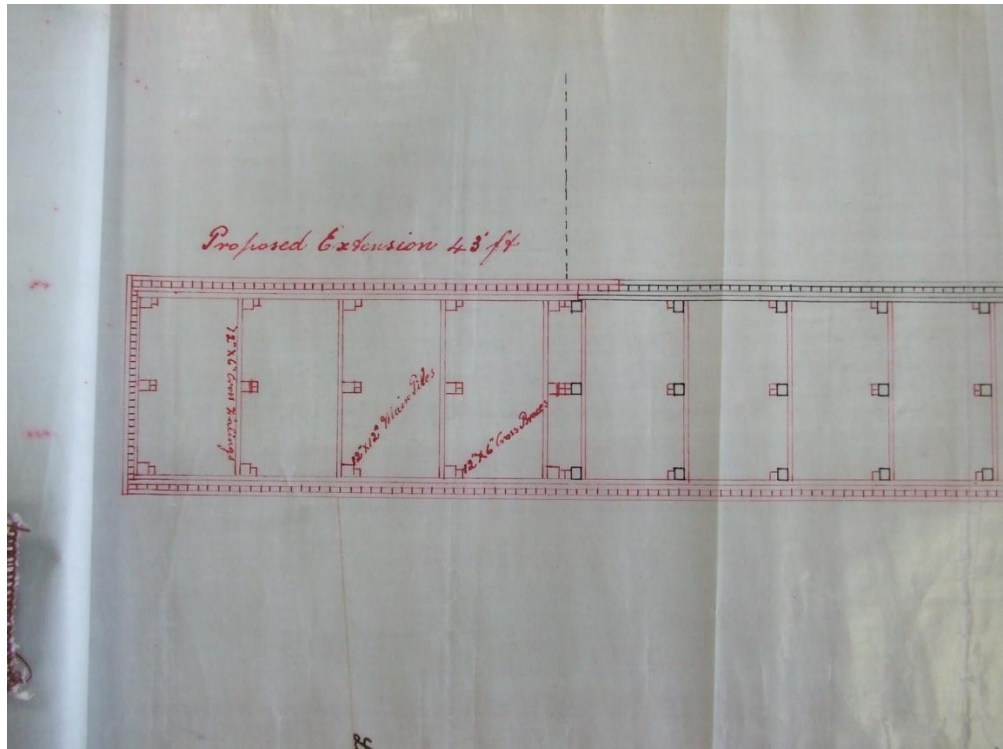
, Southwold, plan of 1902 North Pier rebuilding/extension showing bay divisions (SRO 1312/6/8)
